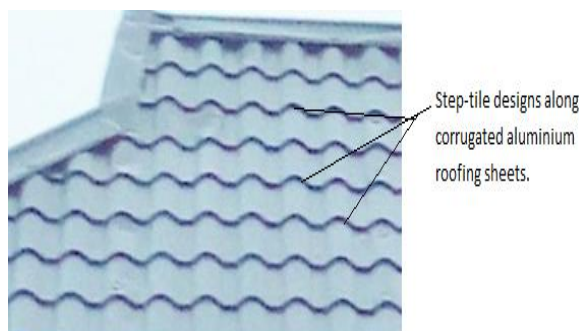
Picture showing installed step-tile aluminium roofing sheet.
